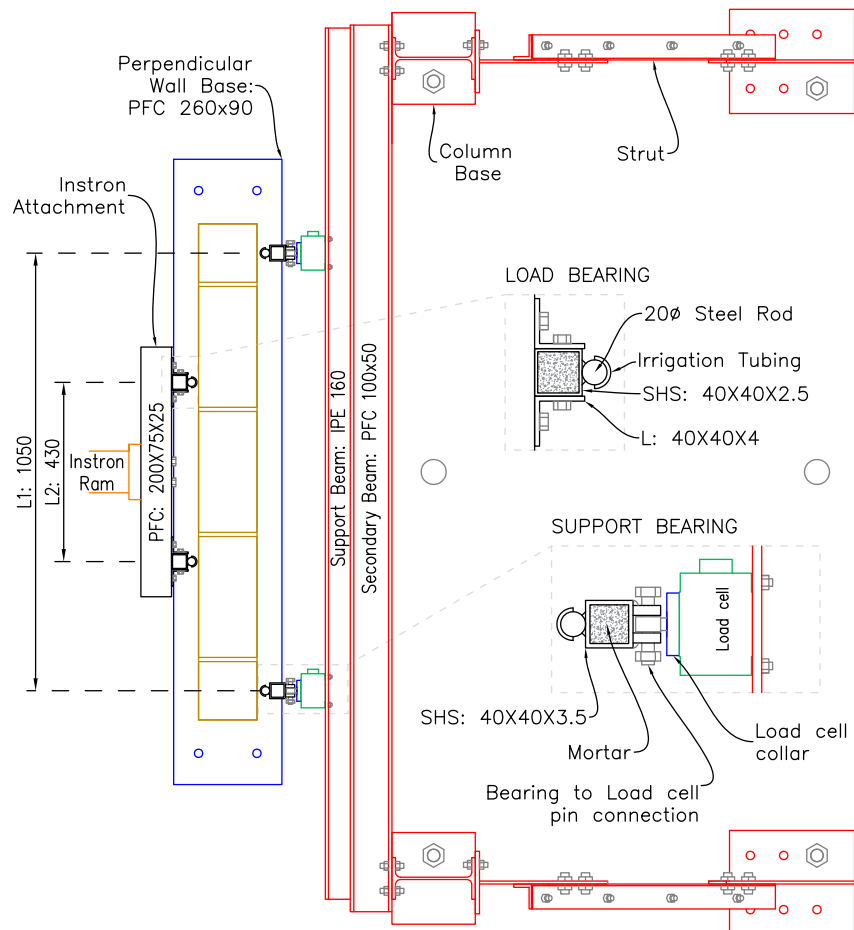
Plan view of the test setup in the perpendicular wall configuration
